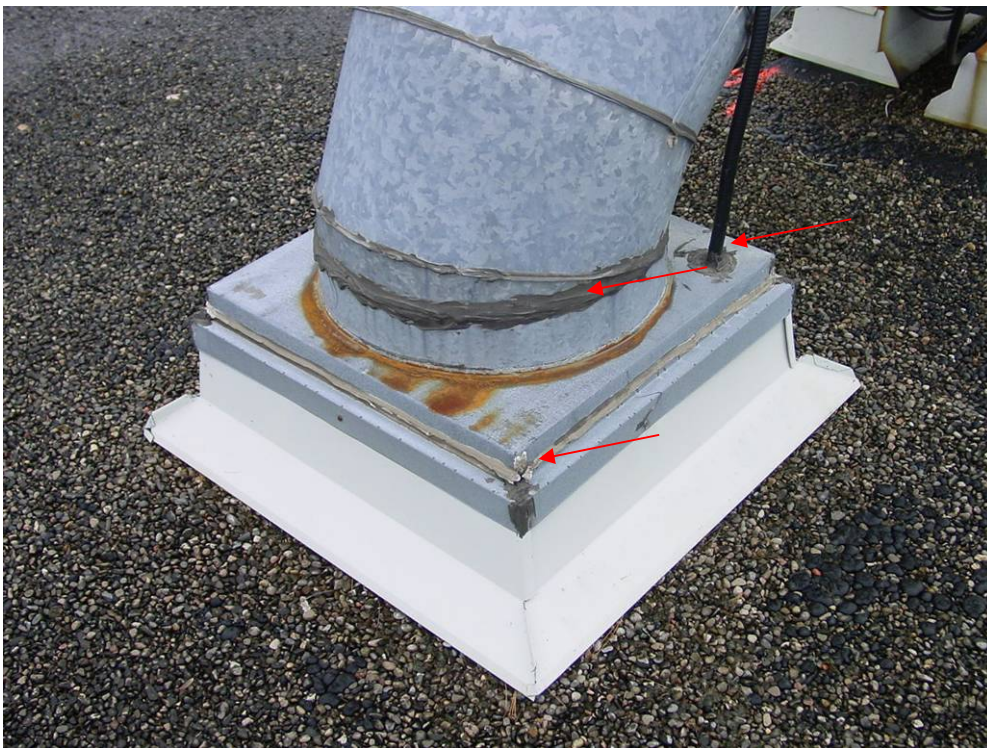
Roof Area 1.1 – Photograph showing the duct penetrations (area of leaks) above the garage.
